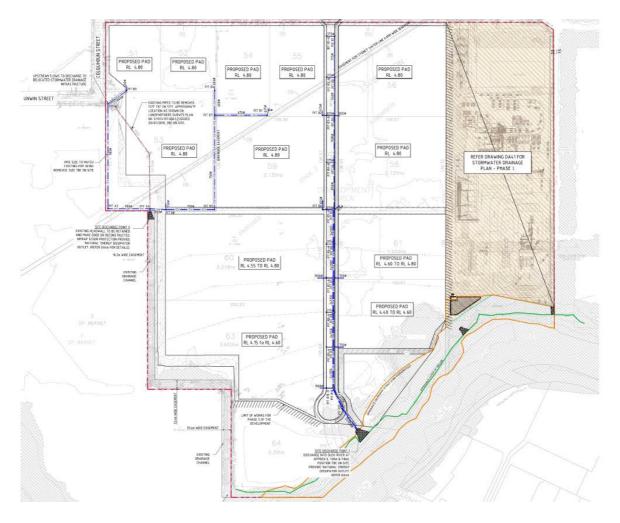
| SSD-10459-Mod 1 Approved Lot Layout and Stormwater Design Layout - CSIE
